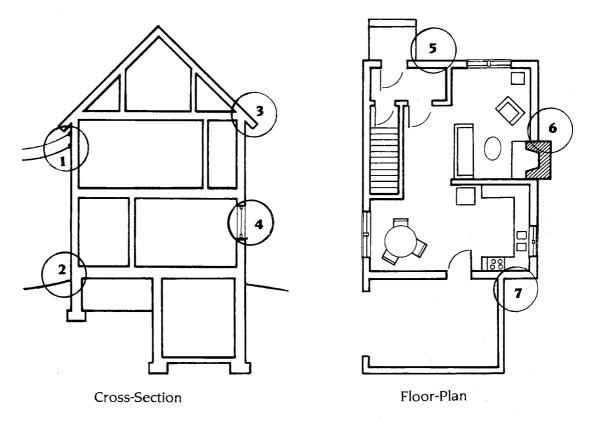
Exterior roof and curtain wall retrofits joined to an interior basement retrofit.
